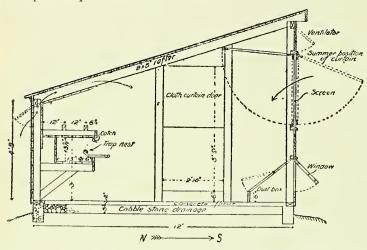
A cross-section plan of the Cornell poultry house with pens 12 feet square.
